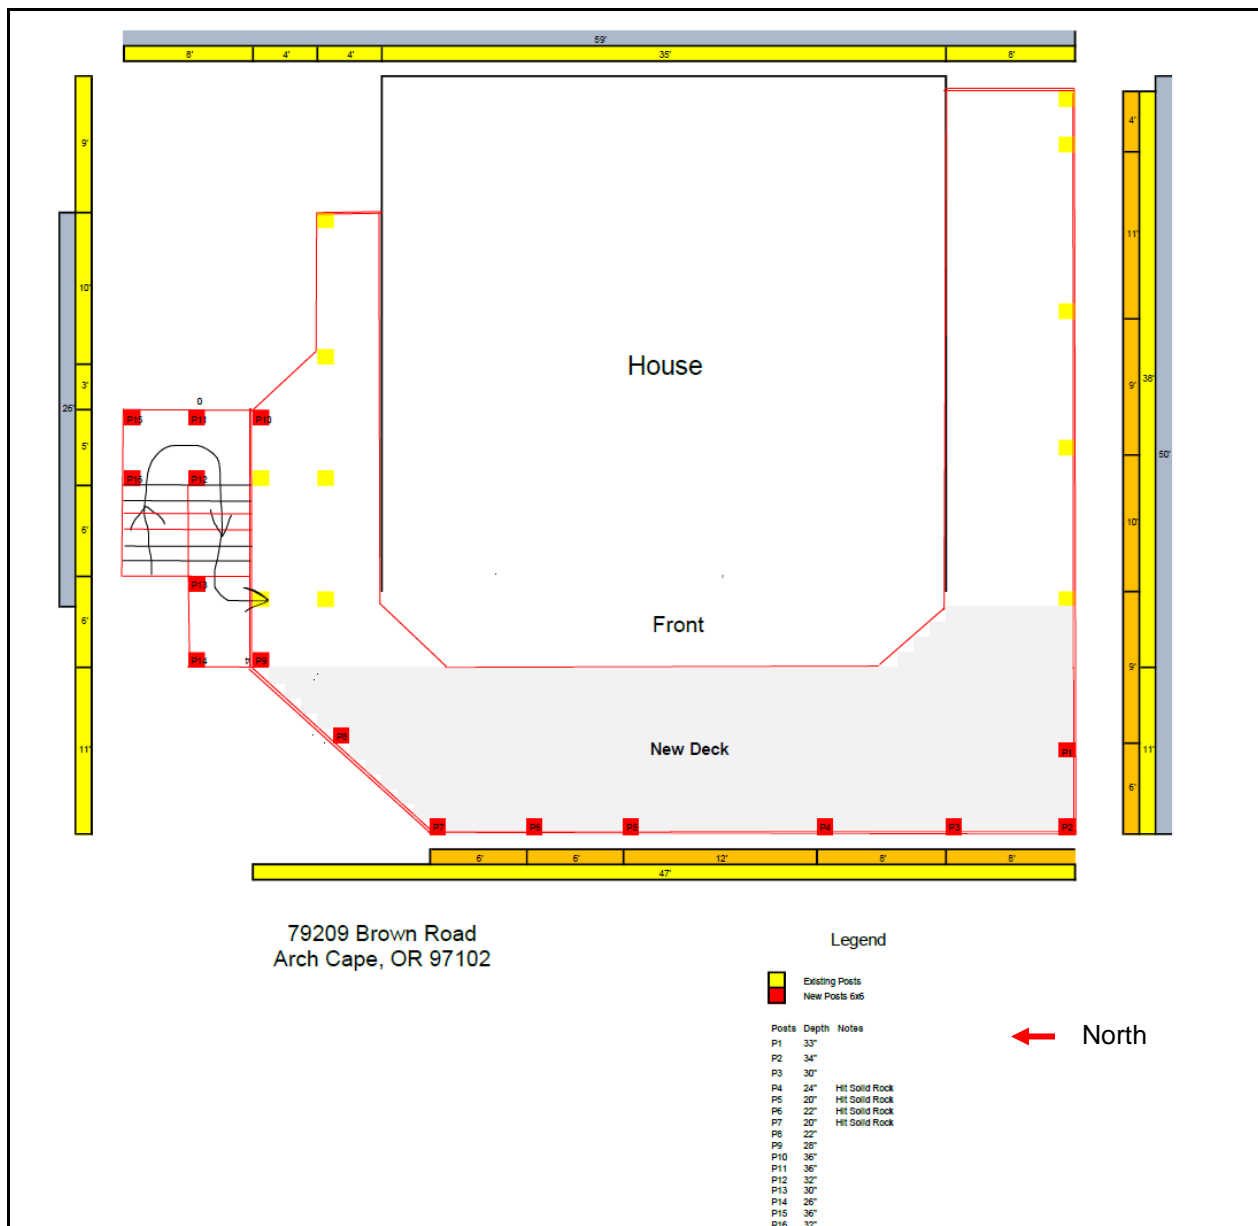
Deck and Pier Plan provided by Tim Durham.
